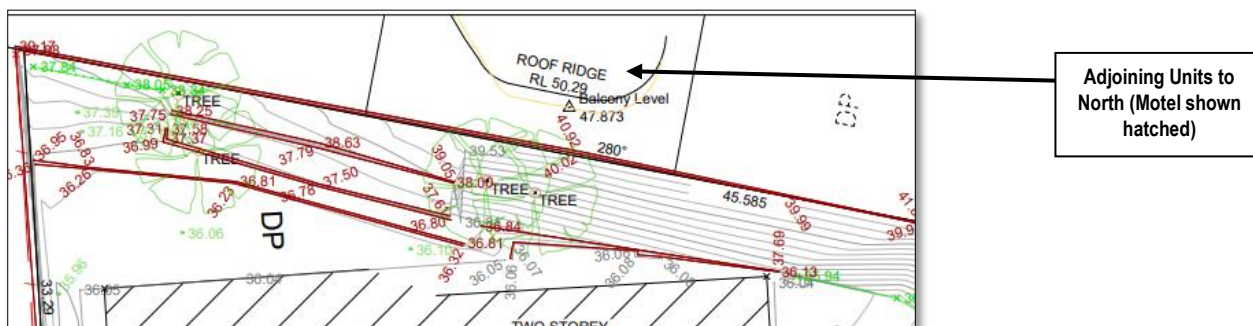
Survey Plan Extract to show RFB to the north with balcony at 2 Windmill St - RL 47.873
